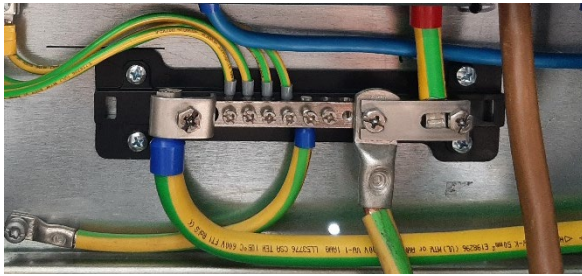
CONNECTING THE FOUNDATION EARTH ELECTRODE
